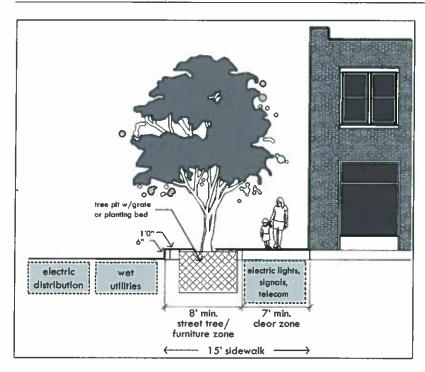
NBG Core Translt Corridor with underground utilities.
